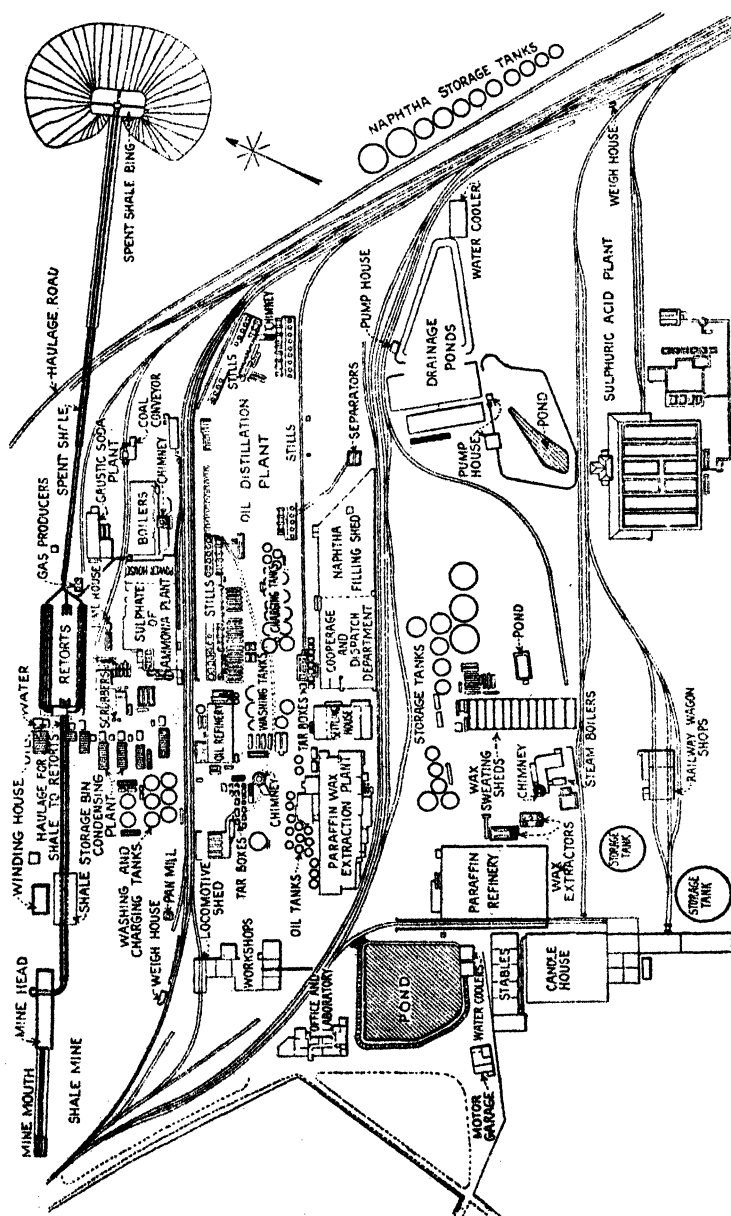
PLAN OF TYPICAL SCOTCH SHALE WORKS.
